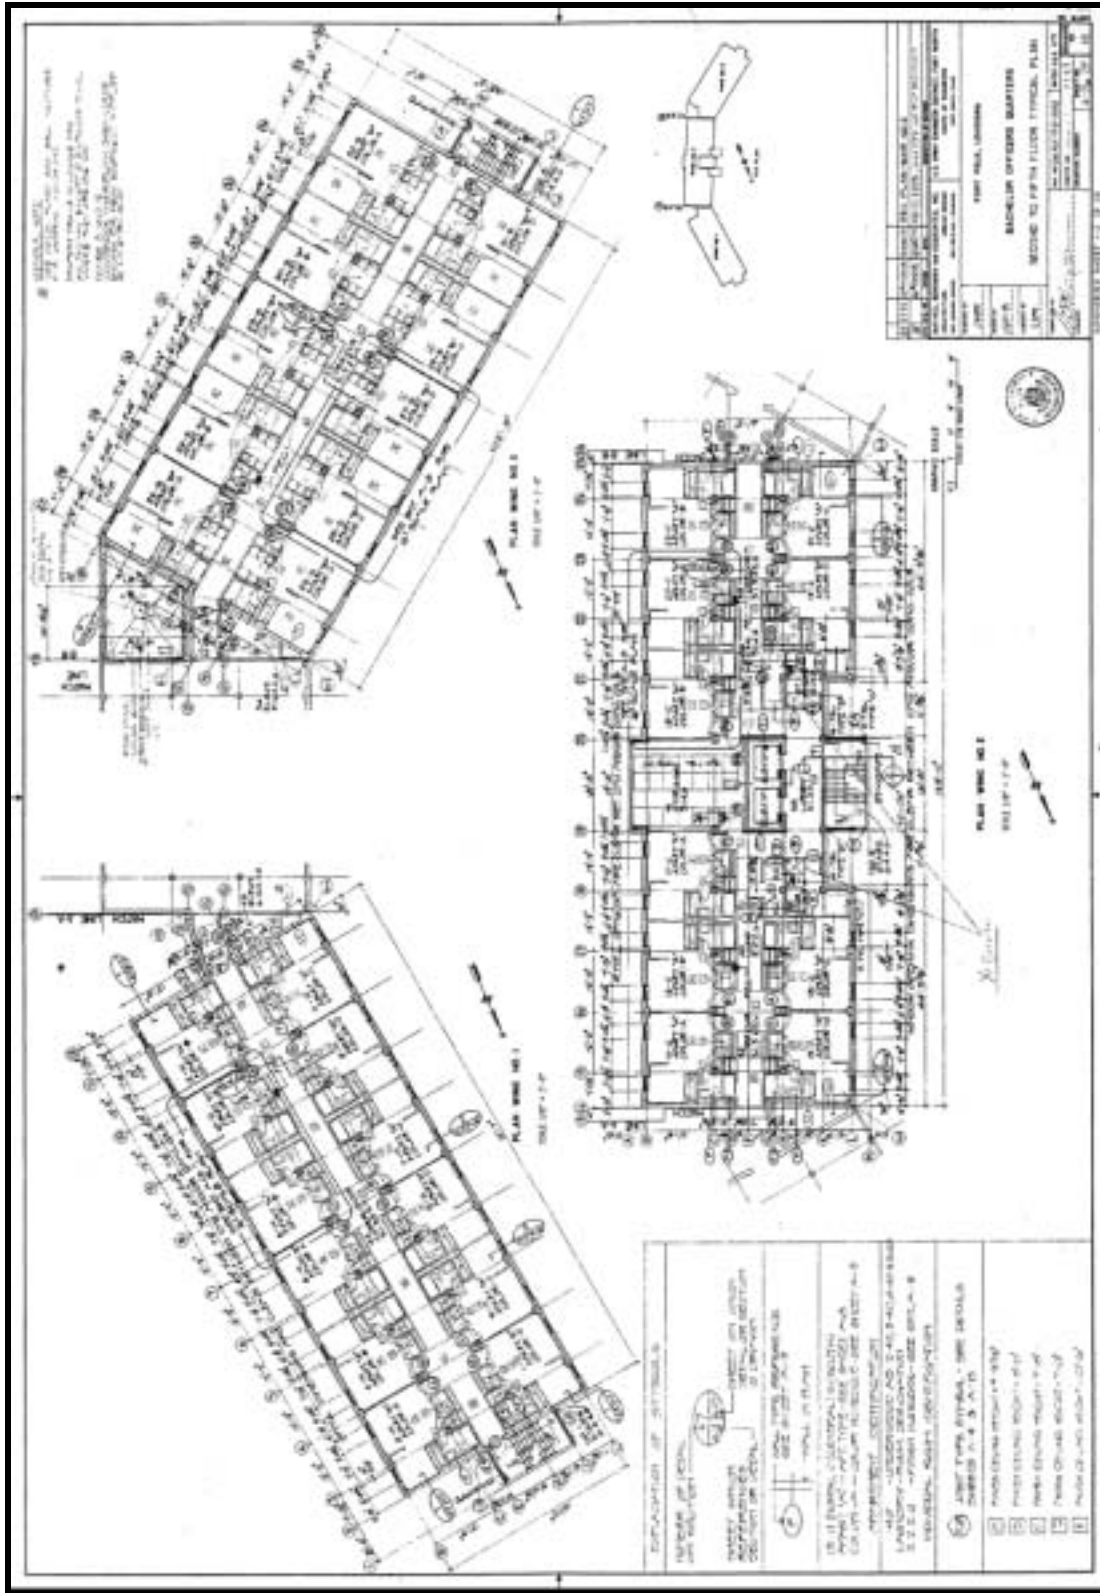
High Rise BOQ, Woodfill Hall, second to fifth floor plan, Ft. Polk (1977, revised 1978) (Engineering, Ft. Polk).
